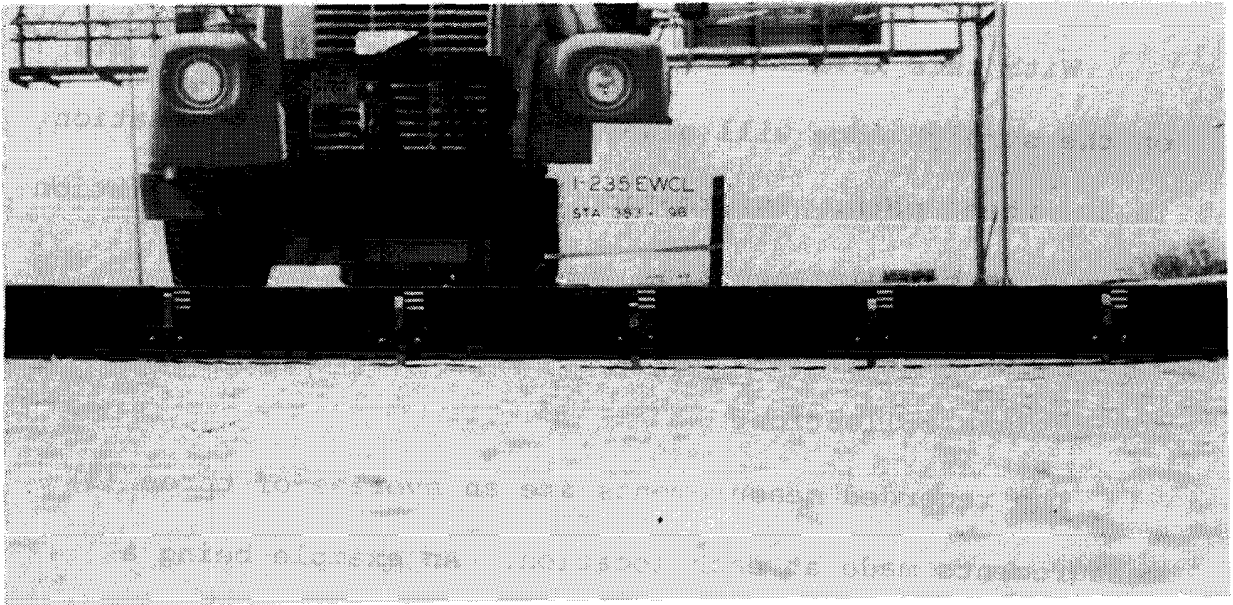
Pavement wear caused by studded tires of portland cement concrete, Des Moines Freeway
